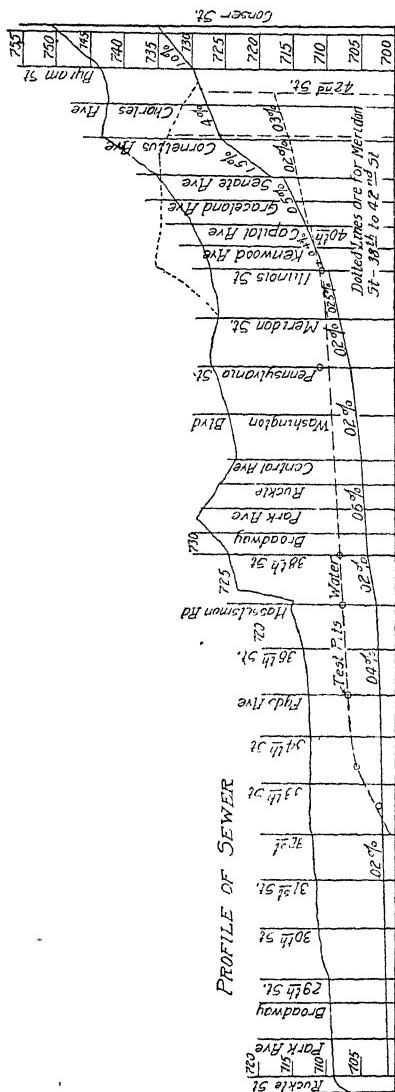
Profile of Sewer Shown in Plan in Fig. 8
